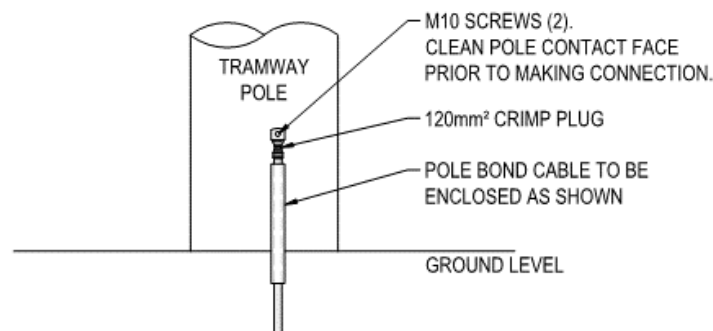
Typical Ballast Track Pole Bond Installation
